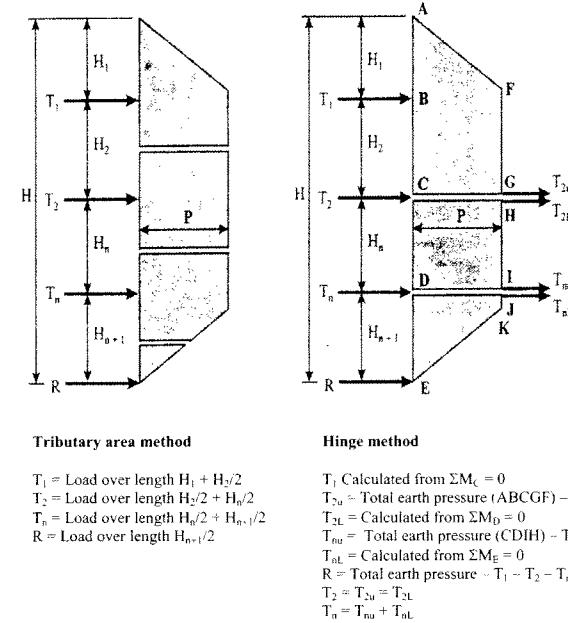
Calculation of Anchor Loads for Multilevel Wall after Sabatini et al. (1999).
